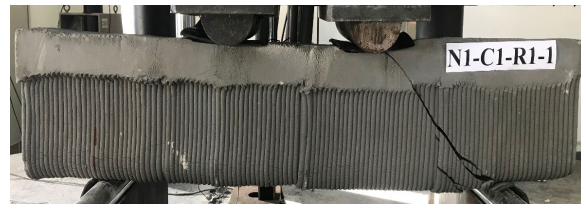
Failure pattern of 3D printed beam with rebar and filling concrete
